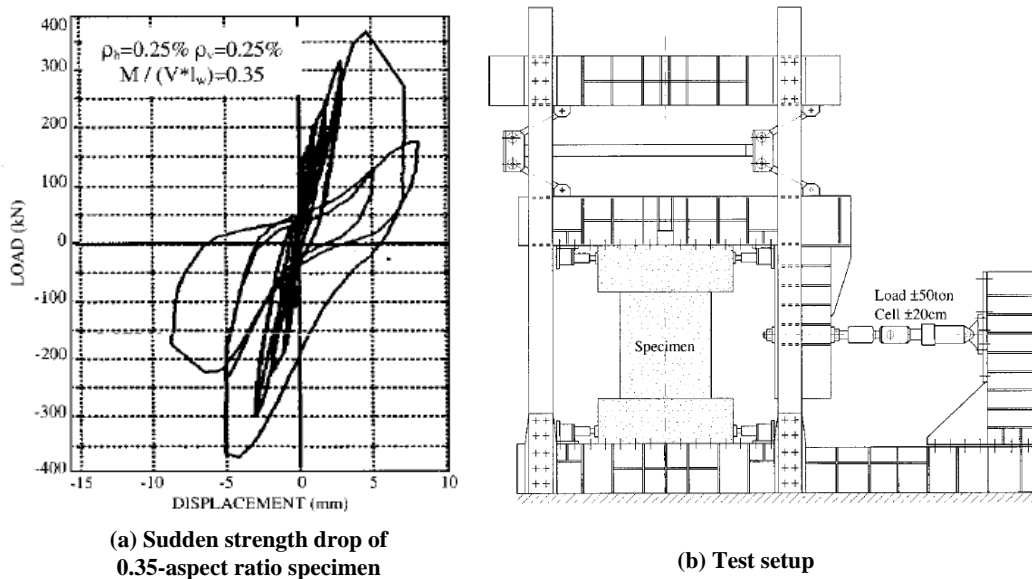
Test setup and typical sliding shear behavior (Hidalgo et al., 2002)
